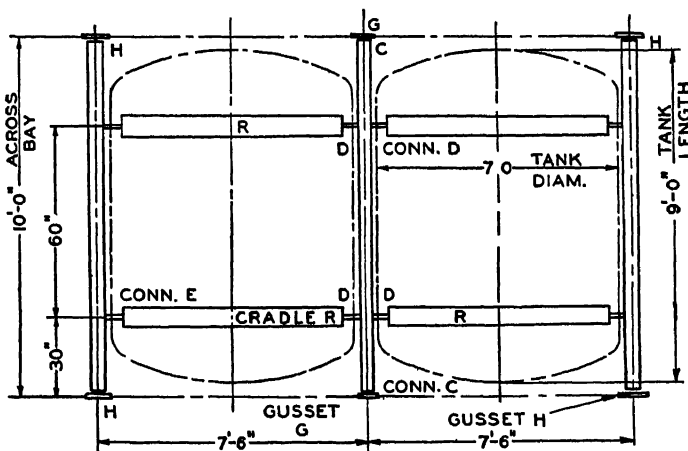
Plan View of Cradle and Beam Arrangement.
